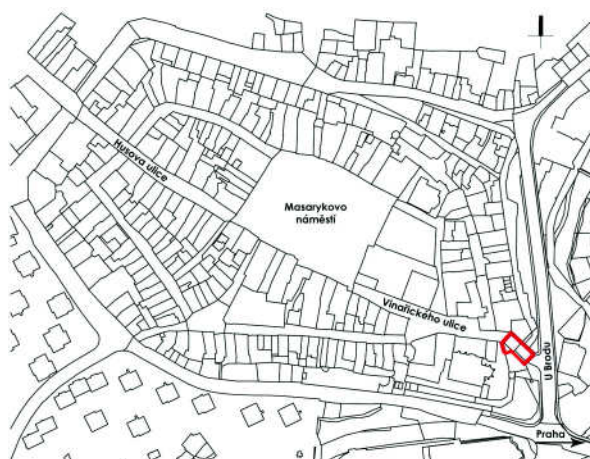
Slany* situation with highlighted construction site of the bridge (author, 2011)
